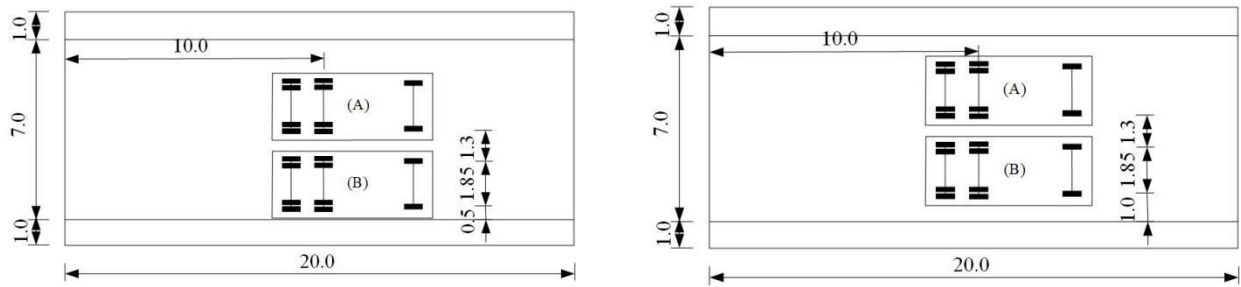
Load cross-sectional view of bridge one (Unit:m)
